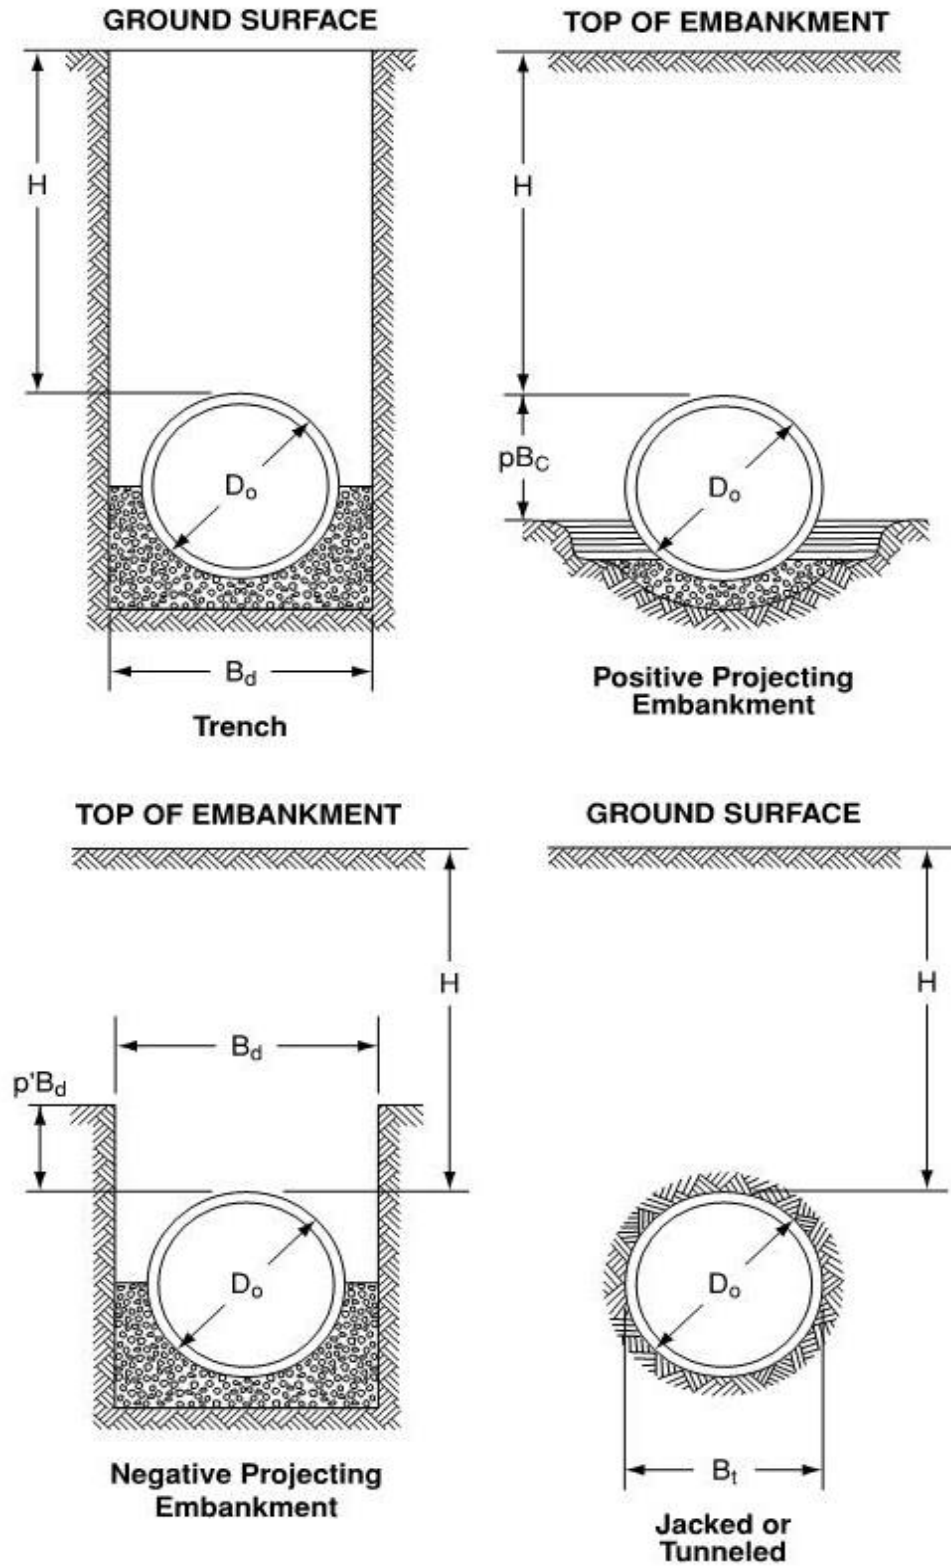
Types of Pipe Installation (ACPA, 2011, pp 27)
